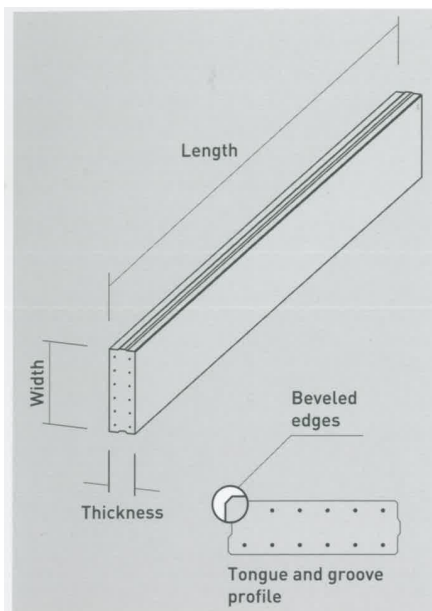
Hebel® Wall Panel (AAC steel reinforced element).
